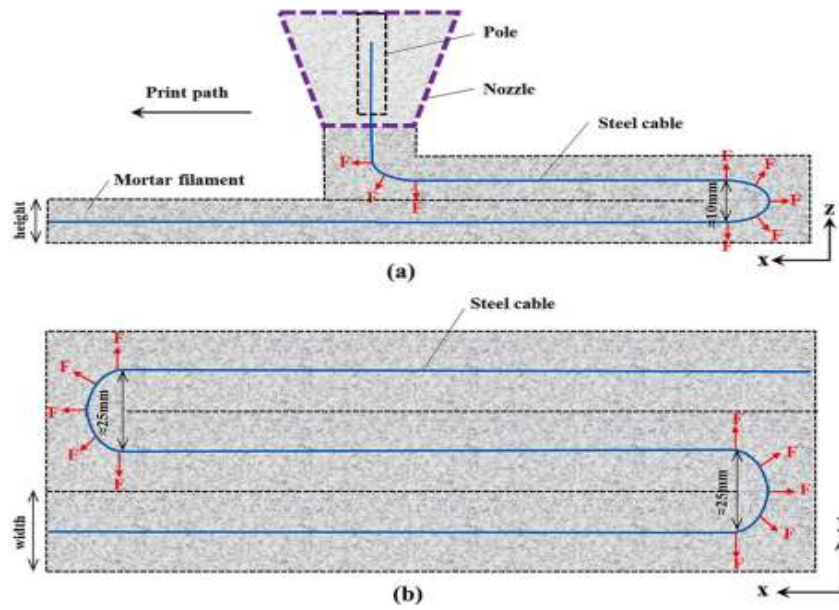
Schematic of bending resilience of steel cable at turns in print path (a) xoz plane; (b) xoy plane [12]
